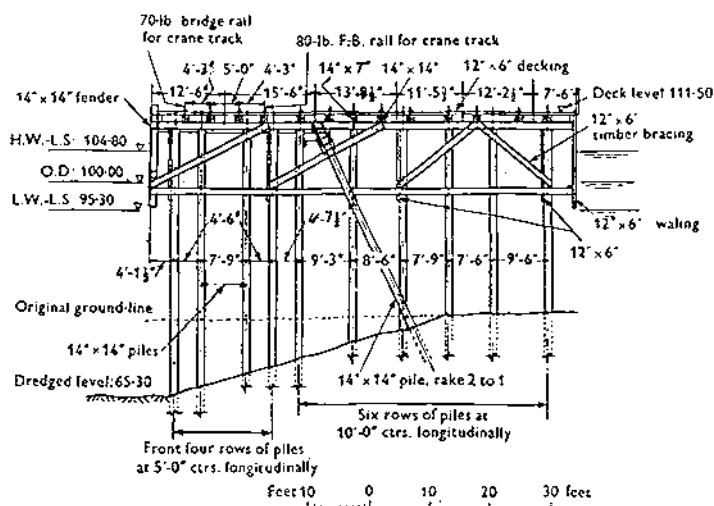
No. 2 Military Port. Cross-section of north deep-water wharf.
